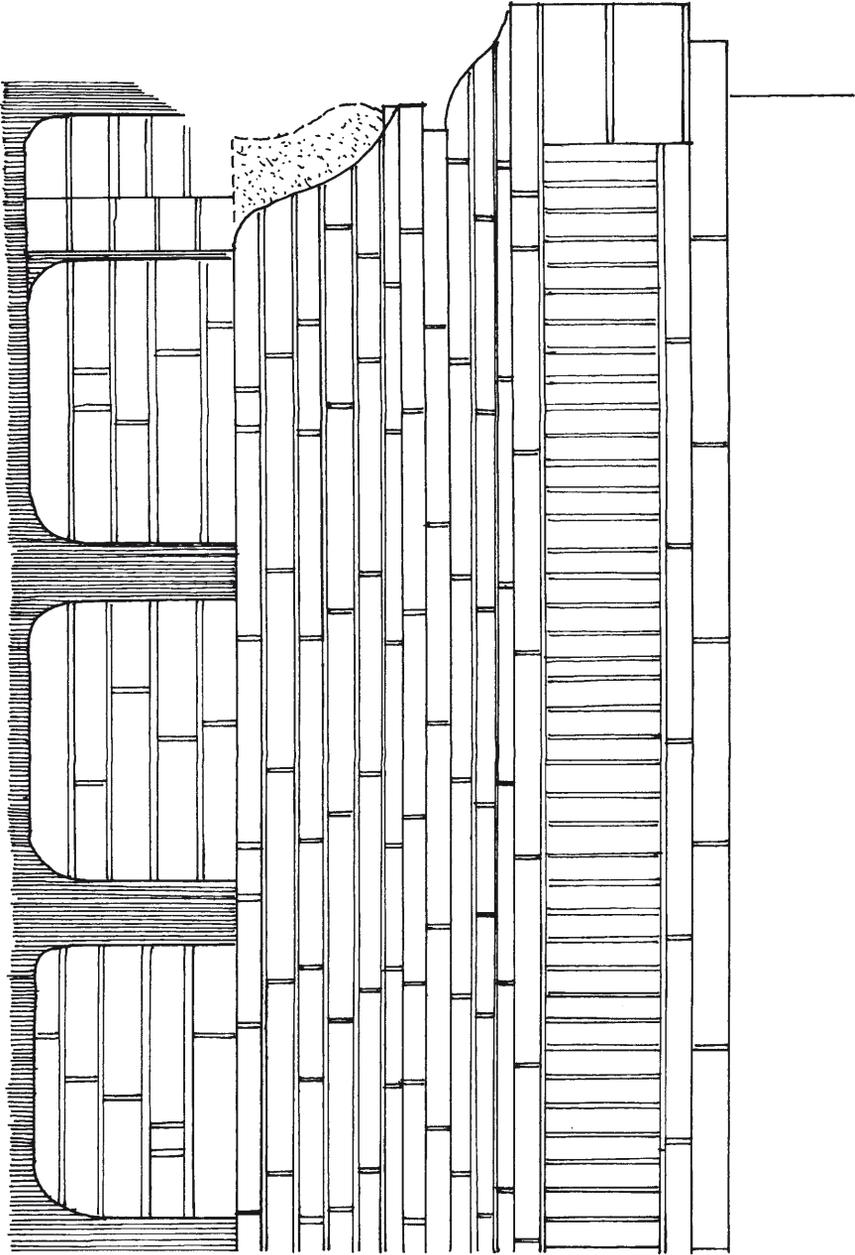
Mingalazedi, masonry detail of the capping of the first floor, western façade.
